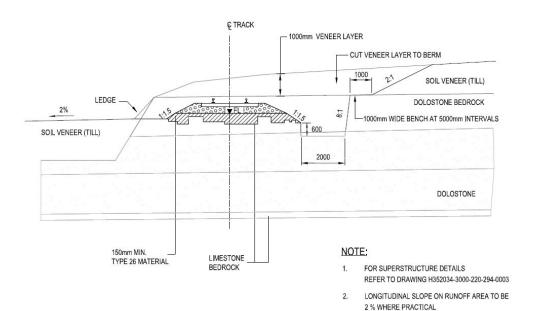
Typical Cross Section of Railway Embankment - Section II
